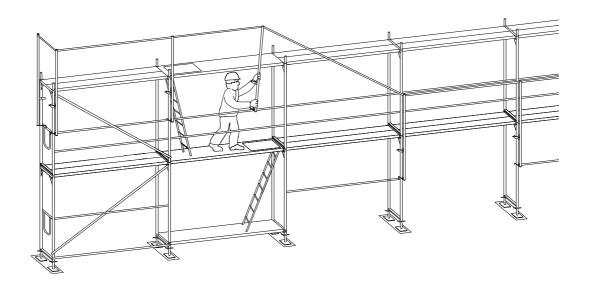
Vertical relocation of advenced guardrail post and telescopic guardrail
